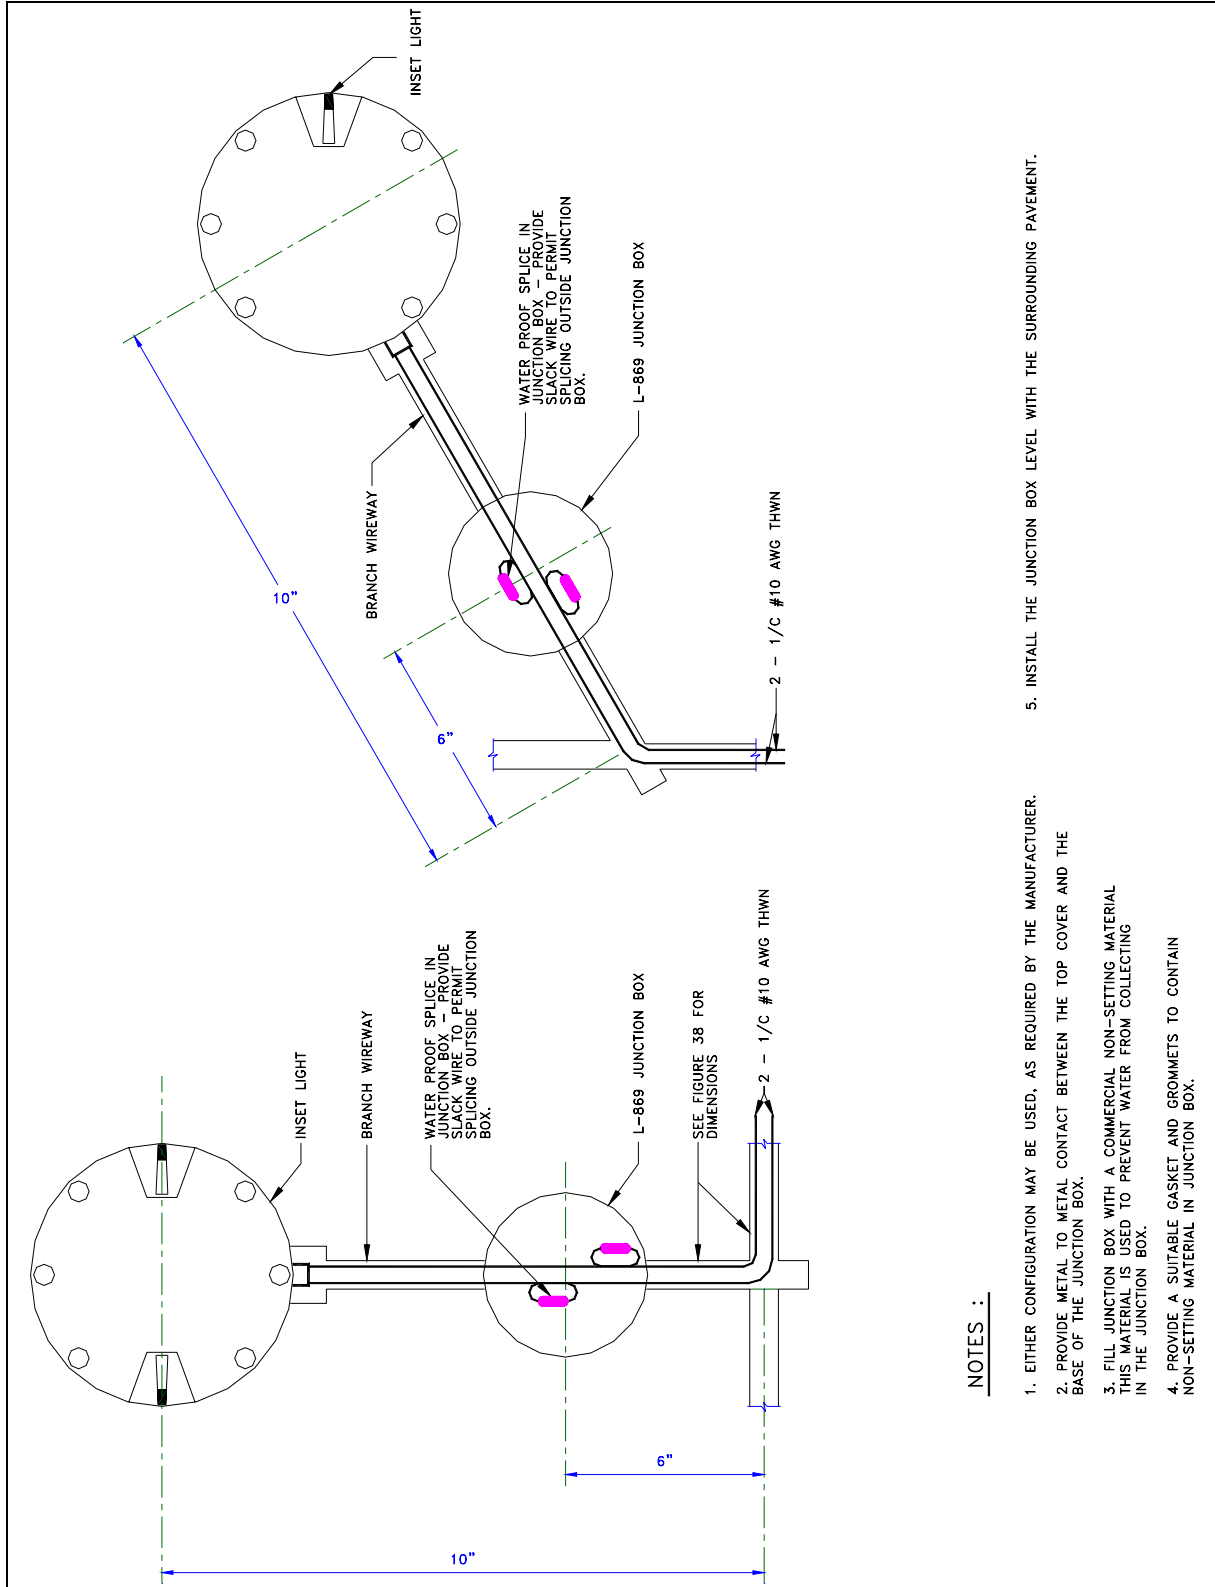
Typical Equipment Layout, Inset Type Lighting Fixtures.
